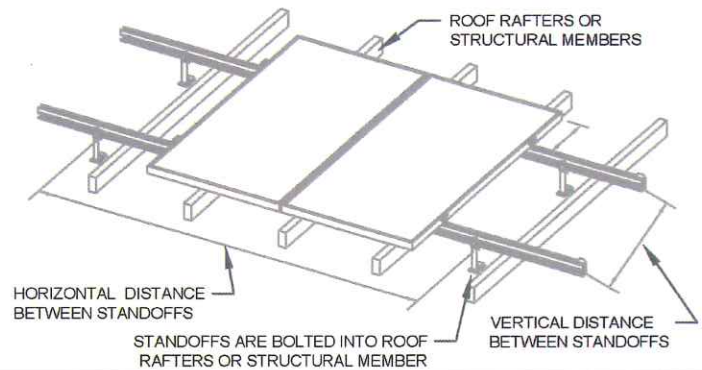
DETAIL ① STAGGERED ATTACHMENTS LAYOUT
